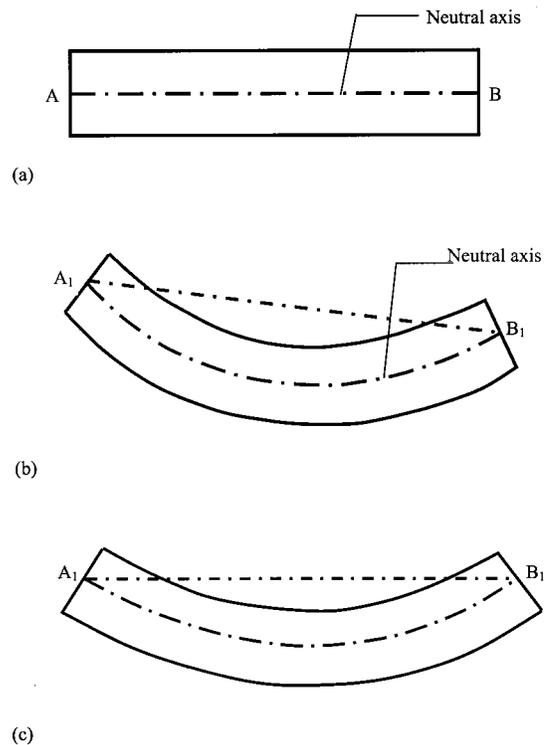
No-torsion condition in buildings with flexible floor diaphragm: (a) Undeformed floor diaphragm; (b) deflected shape of floor slab under in-plane loading with torsion; (c) deflected shape of floor slab under in-plane loading without torsion
